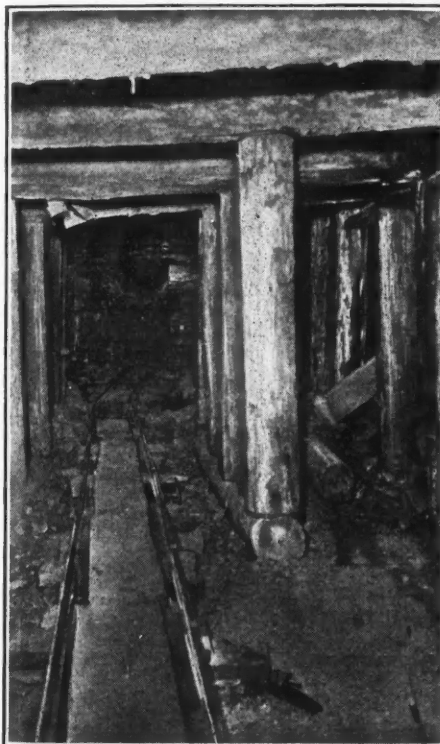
TIMBER REINFORCEMENT ON TRAMPING FLOOR
